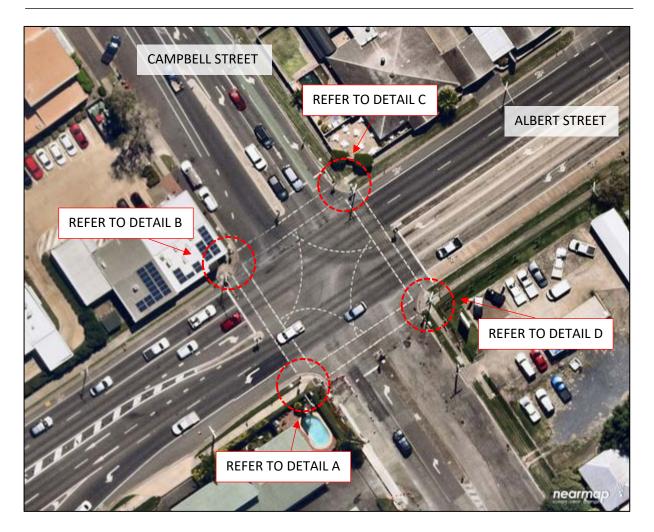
AERIAL OF THE ALBERT STREET / CAMPBELL STREET INTERSECTION
